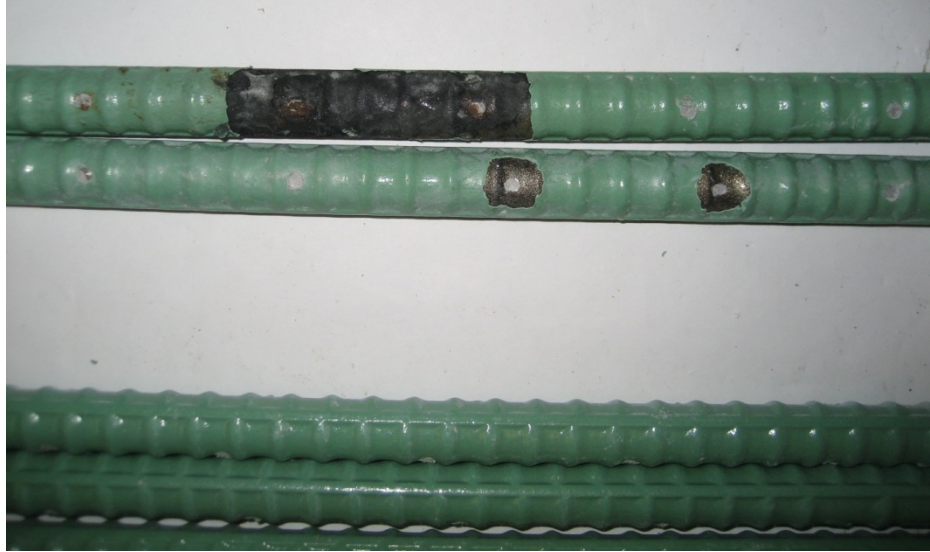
Bars from Southern Exposure specimen 6 containing epoxy coated reinforcement with penetrations in the epoxy after autopsy, showing total disbondment in top mat
